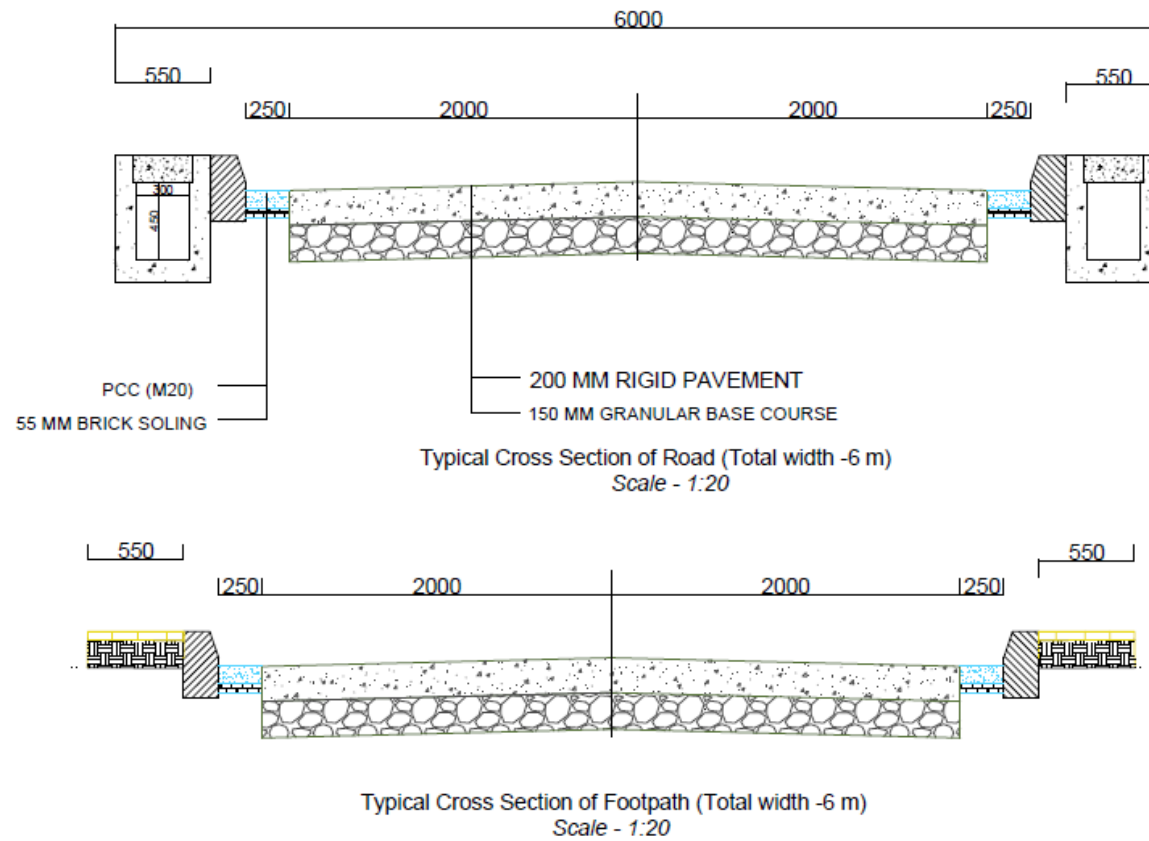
Typical Road Sections with Footpath, Drain and shoulder (8m) in Siddharthanagar
